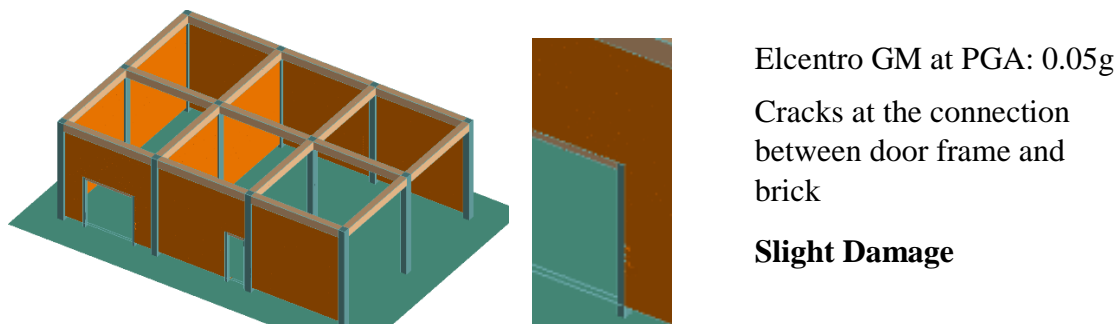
26. Damage Patterns and Damage Level at 0.05g of Elcentro ground motion for RC building one storey Type D
